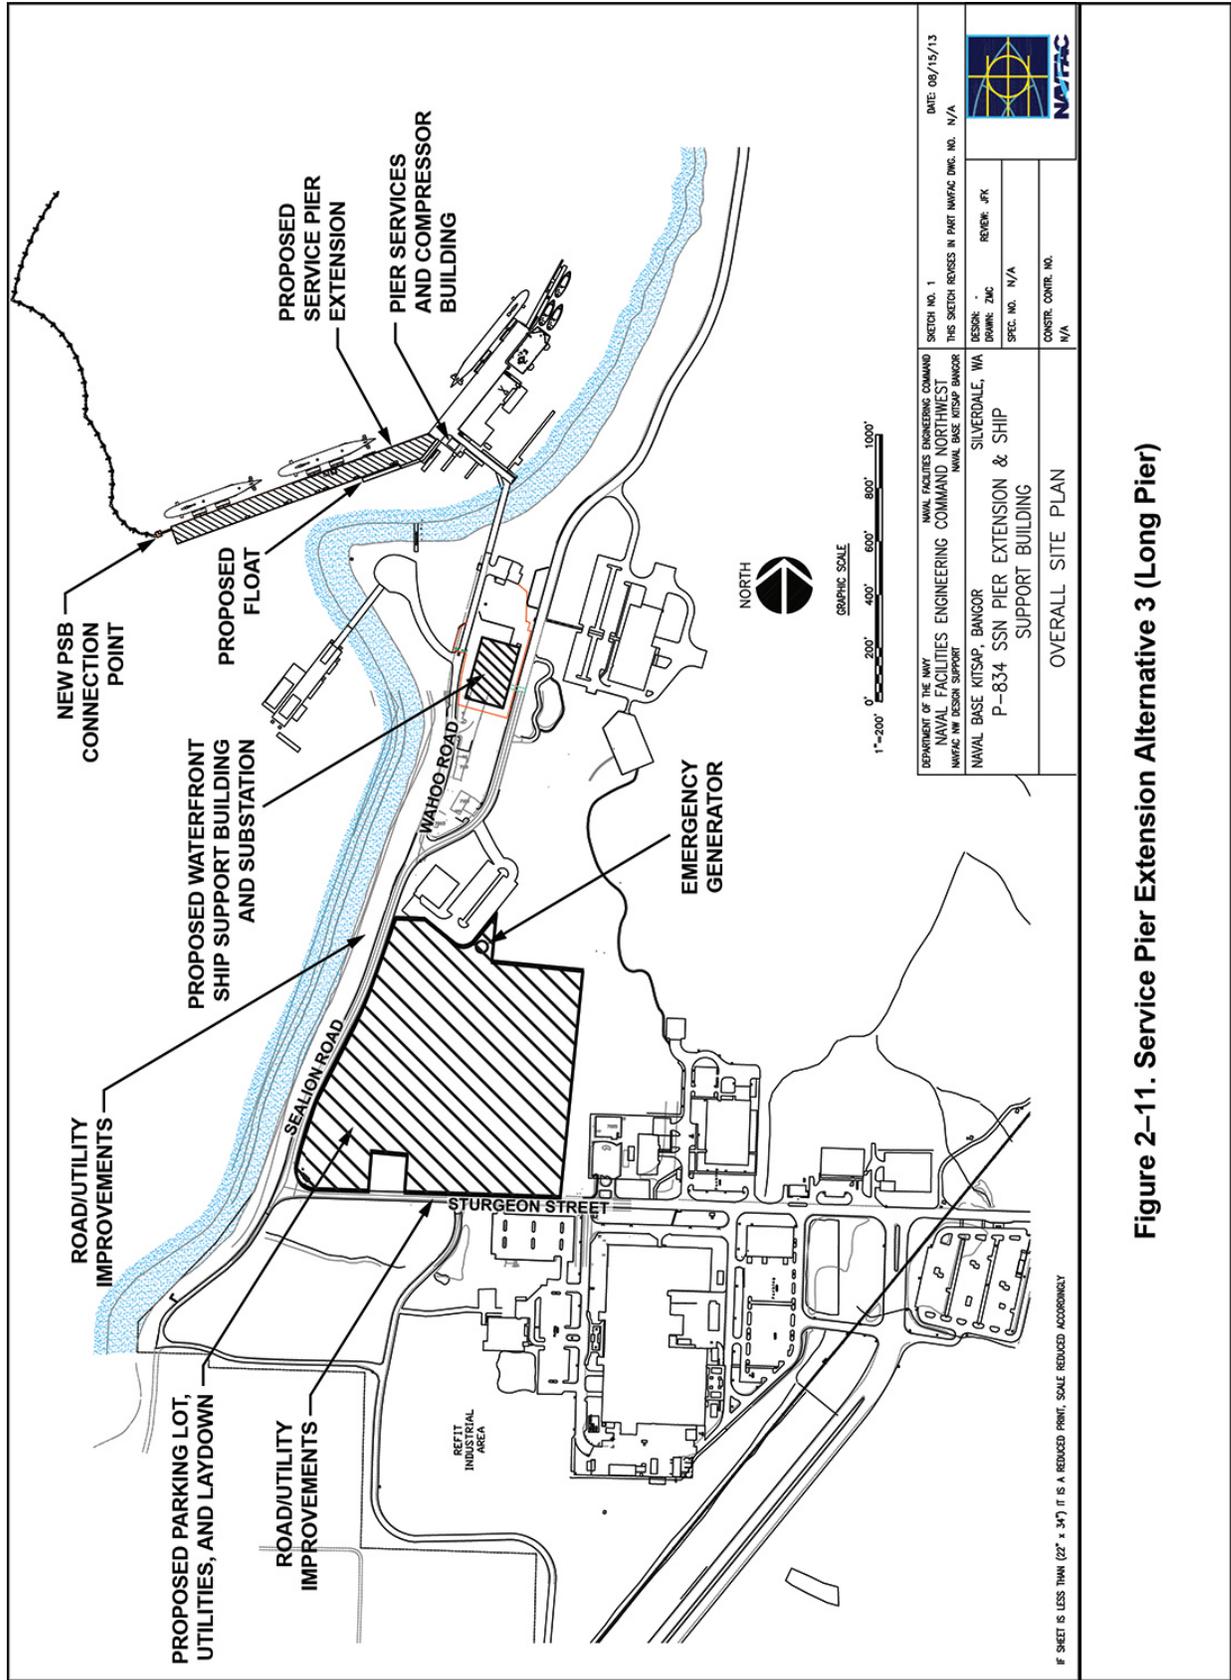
Service Pier Extension Alternative 3 (Long Pier)
